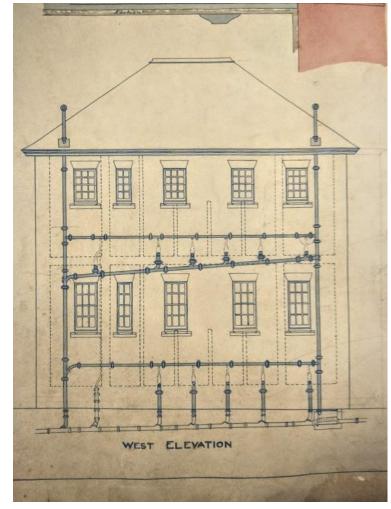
West elevation of the exterior drainage routes (Oatley & Skinner, 1902)
